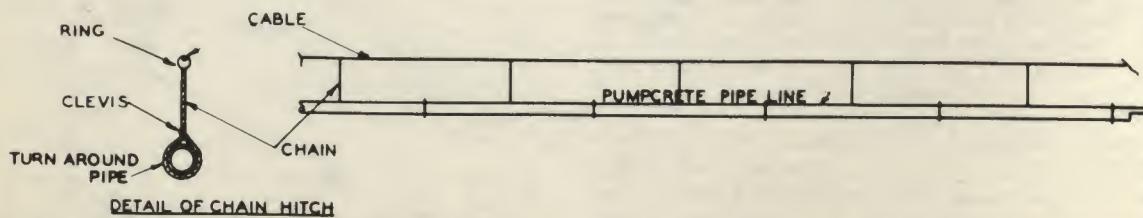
Method of rigging pipeline on a cableway setup. The pipe may be attached to the cable by short chain loops with a turn around the pipe or by short pieces of lighter cable and clamps; the former makes a faster, more flexible setup. When hanging for the first time, pipe sections are coupled on at one end and pushed out. When the line is too long to be
